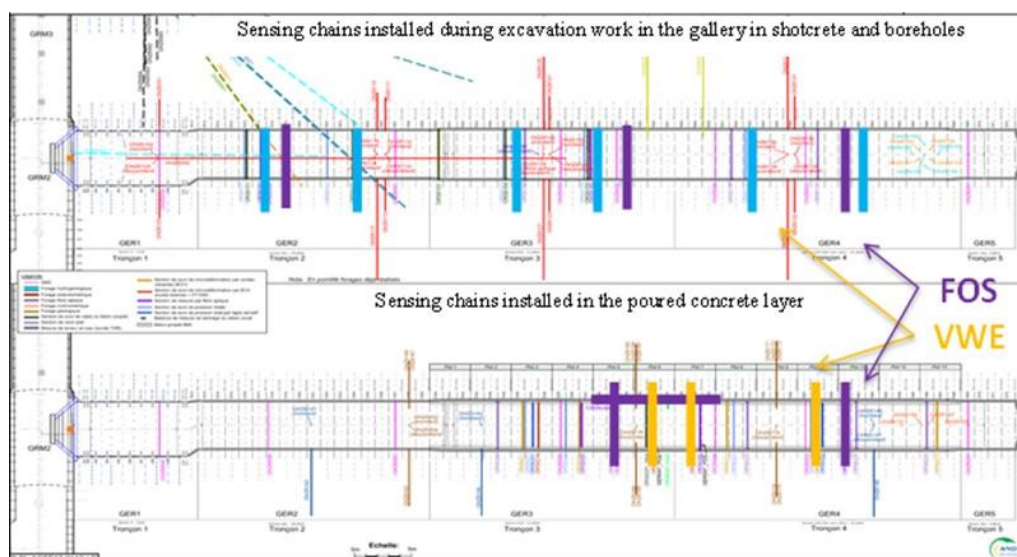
Layout of the full scale demonstrator (gallery) with sensors installed for monitoring system qualification for mechanical parameters, FOS in shotcrete and poured concrete layer (purple) and VWE in poured concrete layer (orange). VWE in shotcrete (blue)
